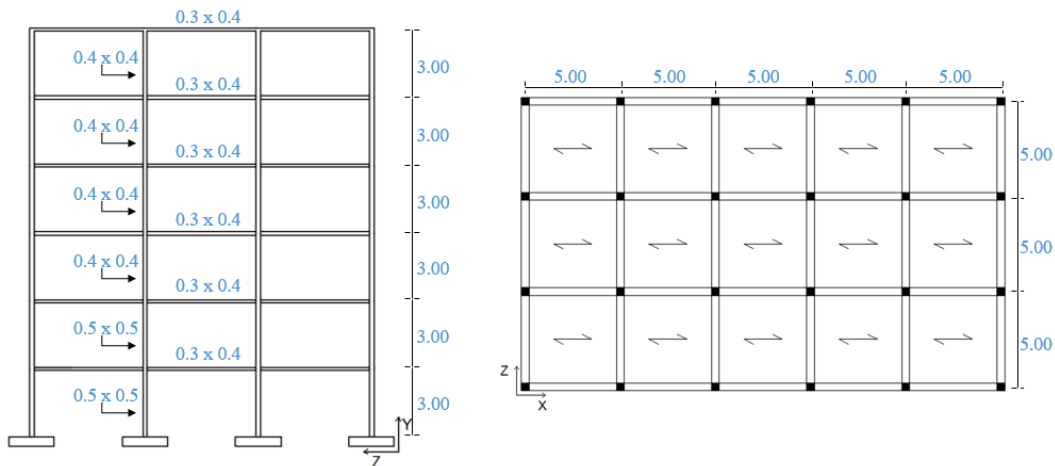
Elevation and plan view of the case-study building (dimensions in meters)
